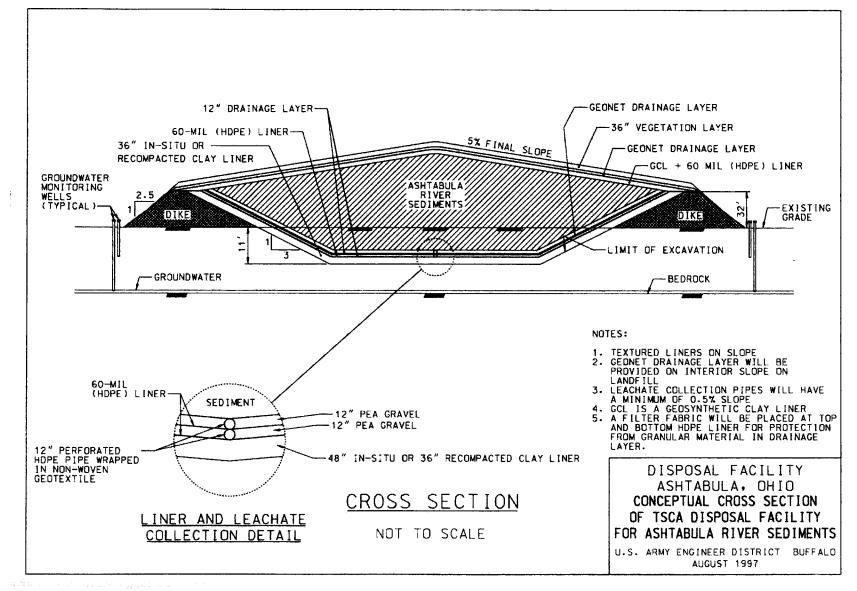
Conceptual Cross-Section of TSCA Landfill Disposal Facility.
